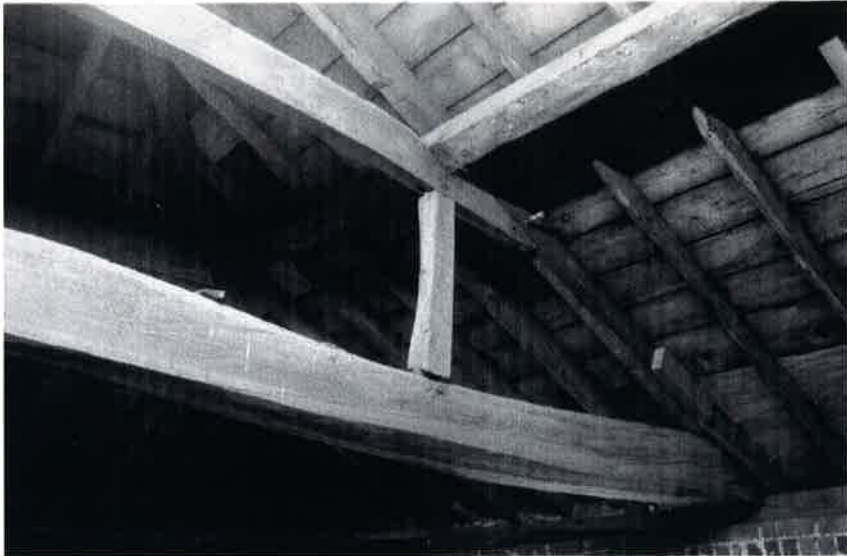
Roof truss detail at SW corner of F3. Note more slender timbers than in west wing.
